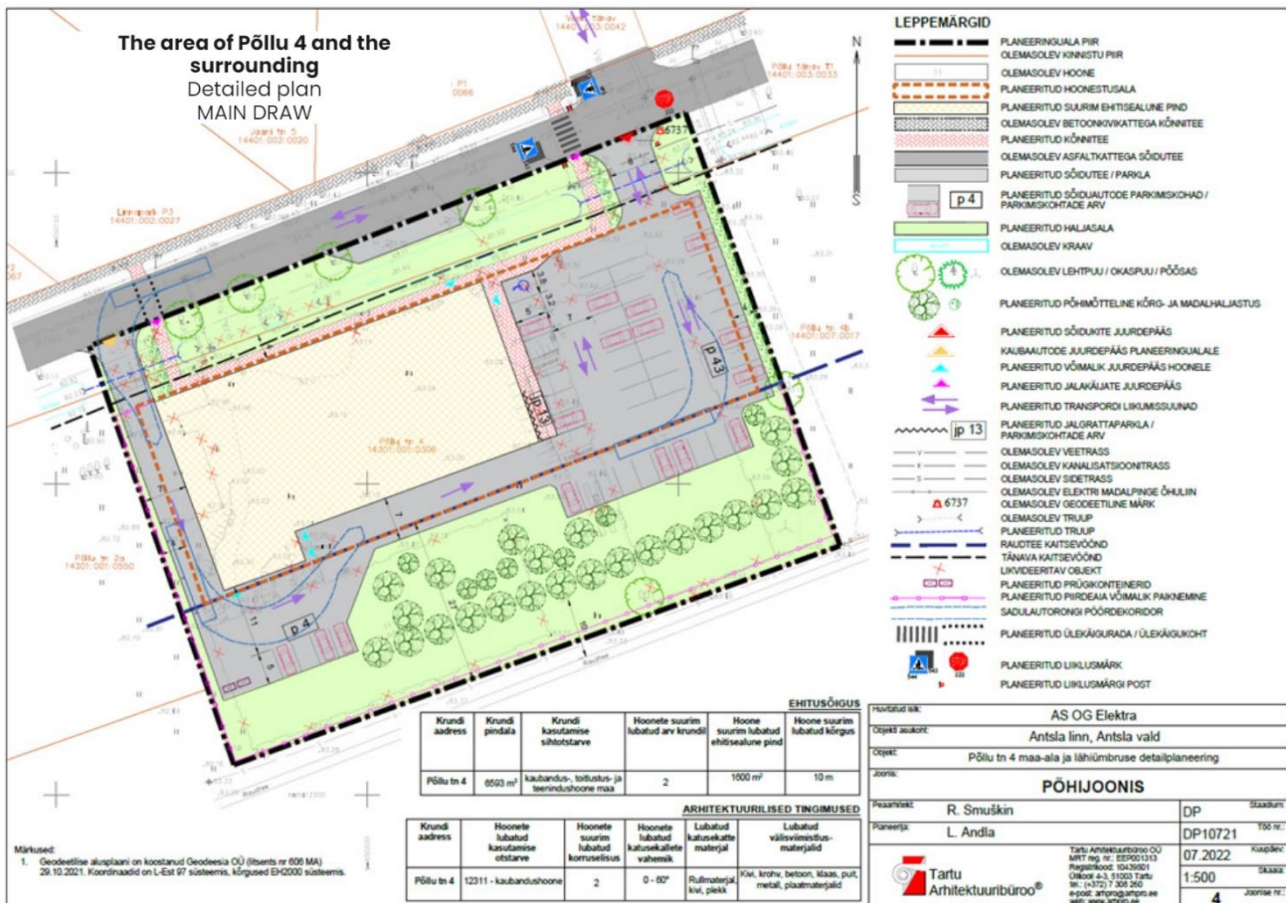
Põllu tn 4 Area and Surroundings Detailed Plan, showing land use and development specifics (scale 1:500)
